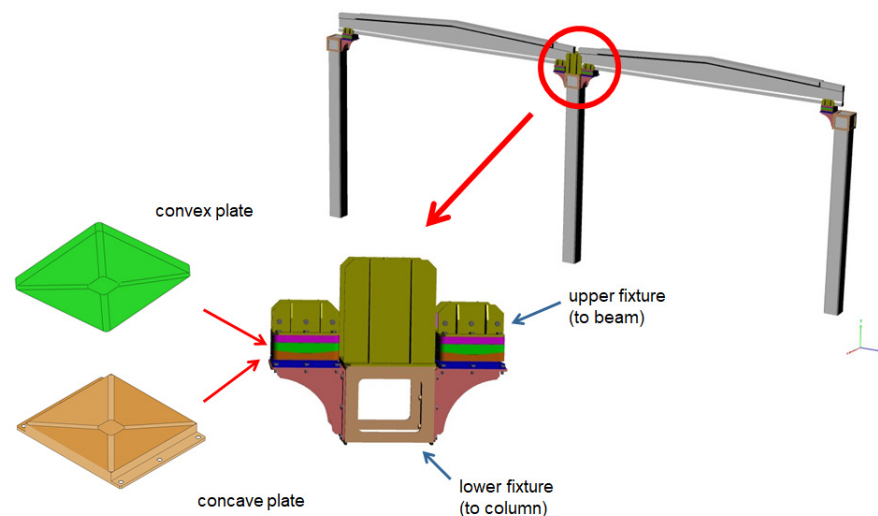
Sketch of the dissipative connection system and typical installation at beam-to-column joint.
